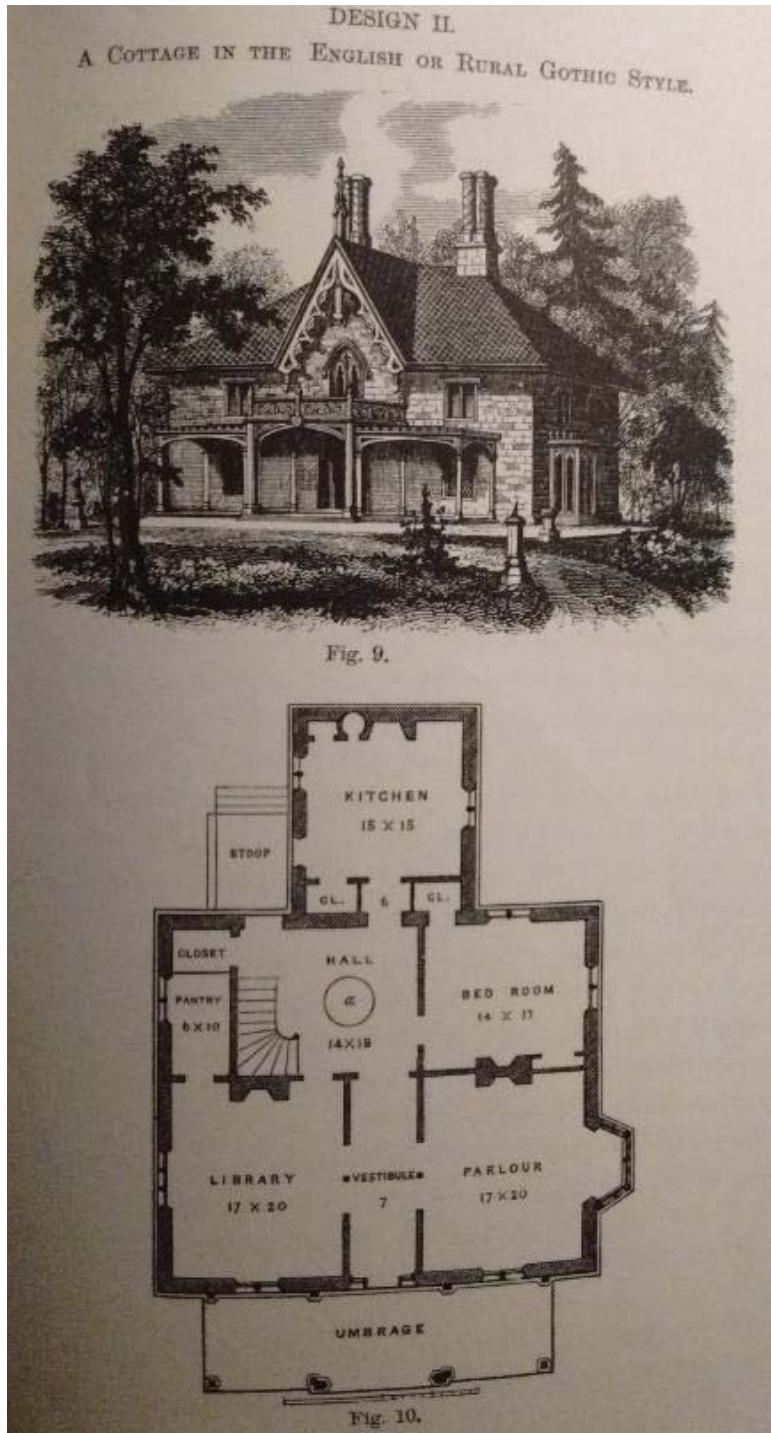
A J Downing, *Cottage Residences* floorplan, 1842.
